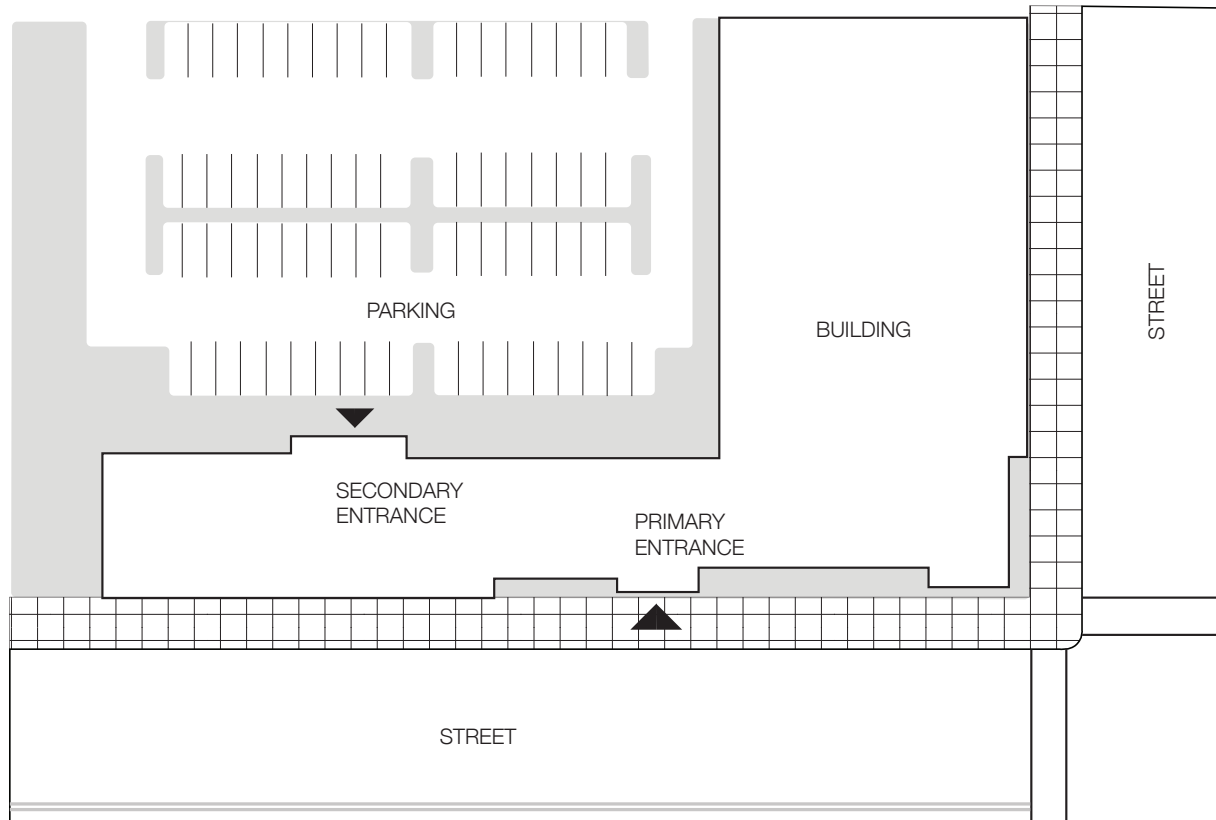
This image shows how parking is located in the inner part of the block to allow buildings to create a continuous sidewalk and street edge. Primary entrances are on the public sidewalk with alternative entrances adjacent to the parking.
